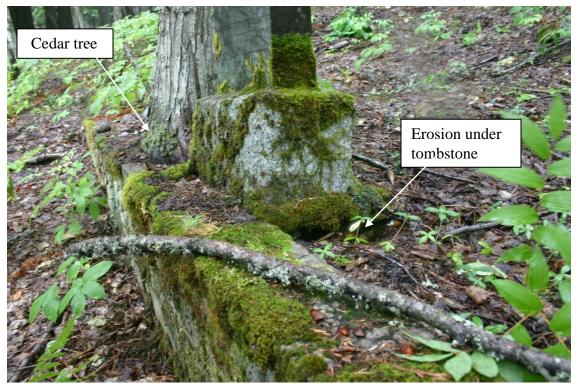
Plot 286 (Johnson), showing undermined tombstone and cedar tree growing over cracked and leaning concrete retaining wall.
